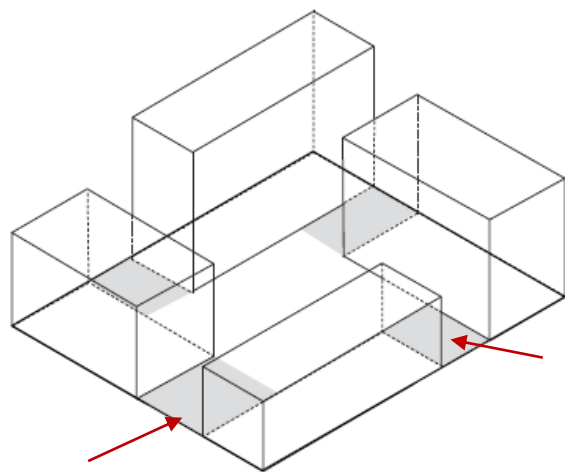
Passageways: New construction is constructed as open carriageway, consisting of independent buildings, physically separated by passages at full building height.
